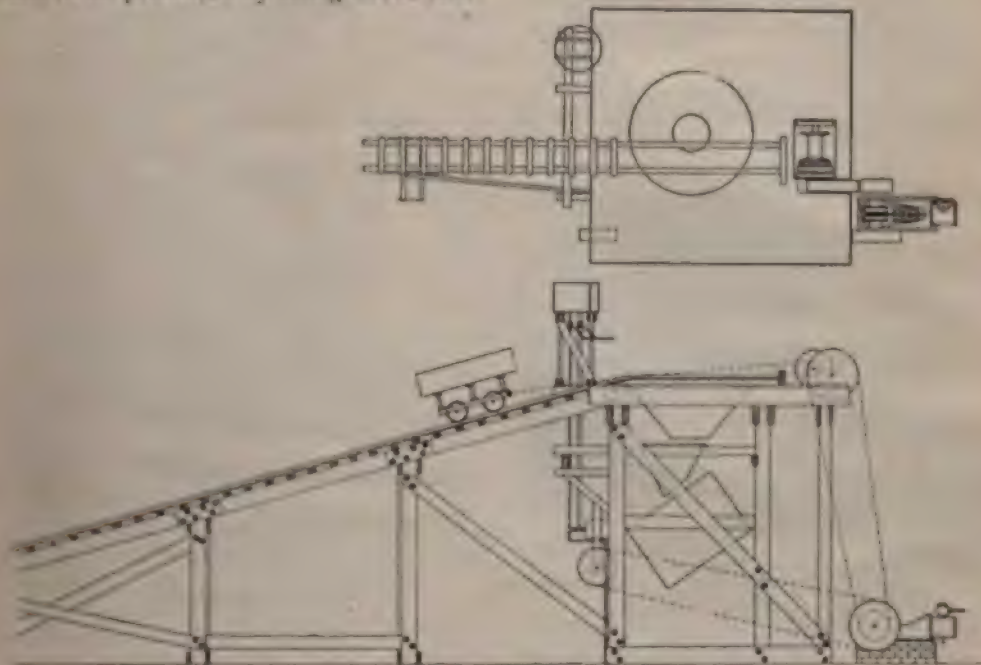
Details of hoisting and inclined concrete mixing plant.
